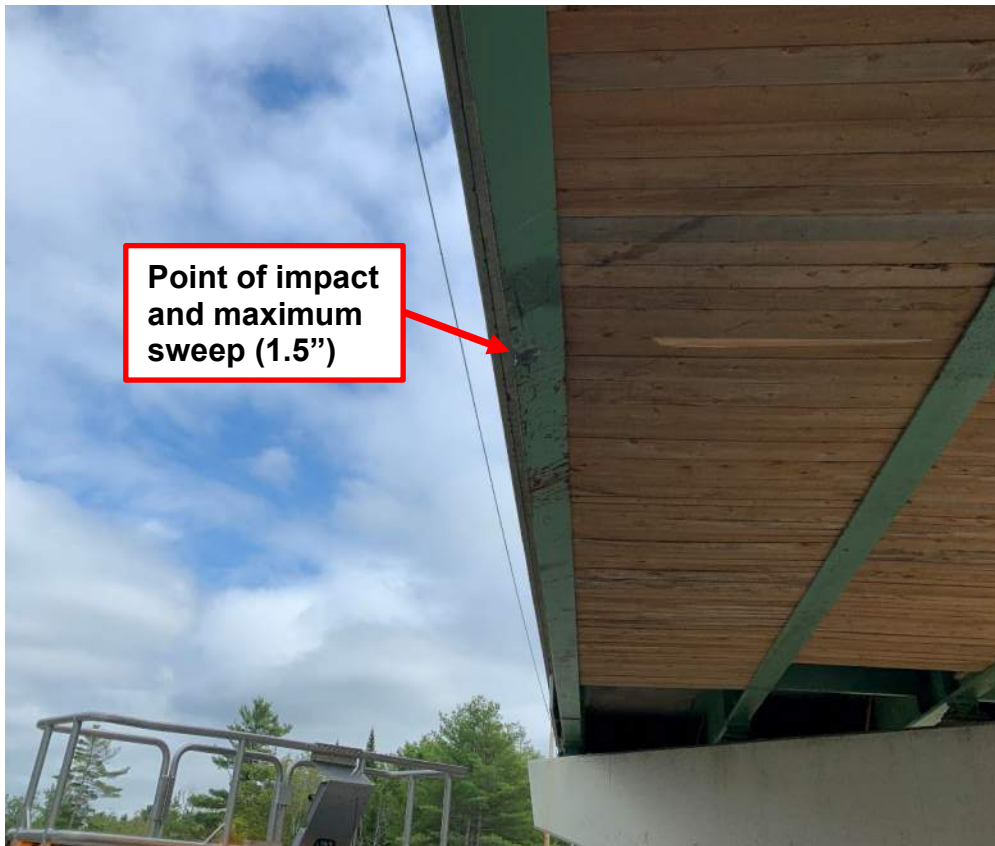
Girder G1 Collision Damage (Looking East)
